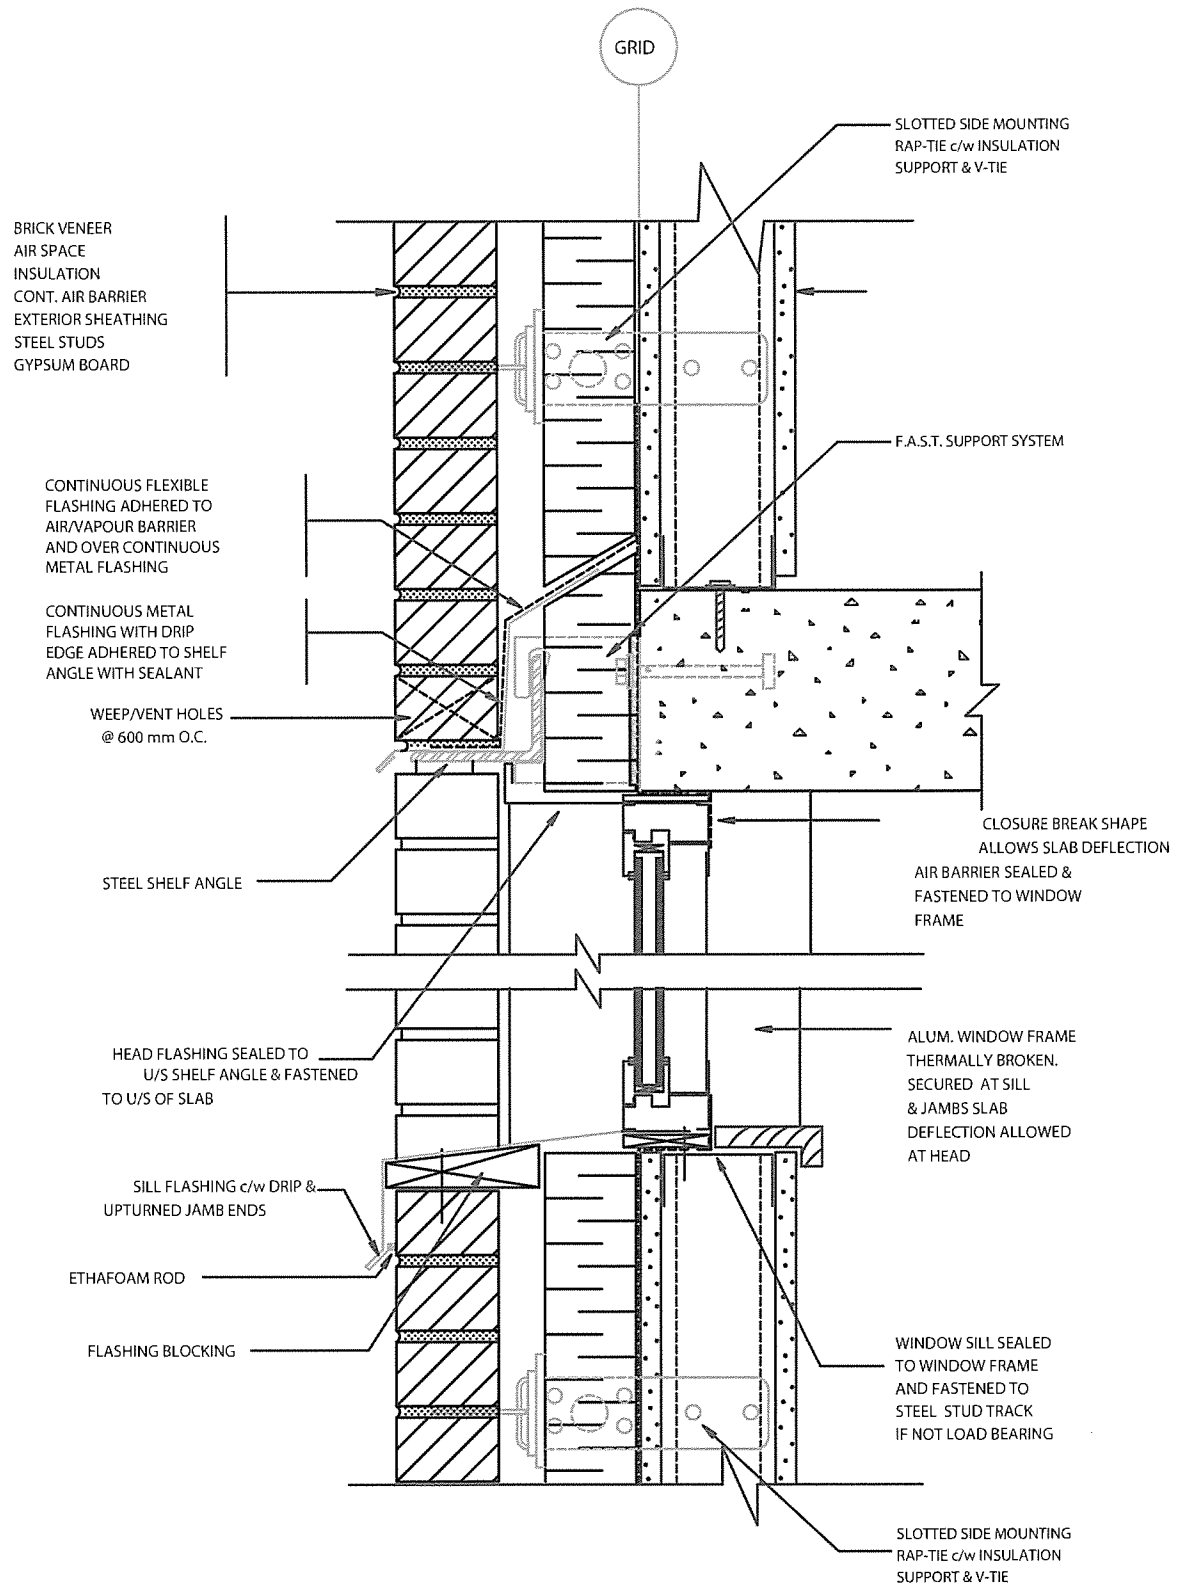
BRICK VENEER / STEEL STUD - WINDOW HEAD & SILL DETAIL
